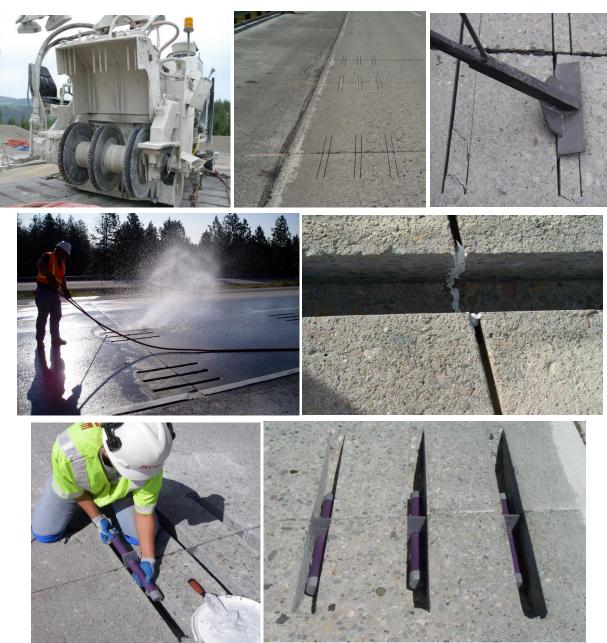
Typical Dowel Bar Retrofit Sequencing of the Installation From Figure 4-9.7, Construction Procedures for Retrofitted Dowel Bar Installation Techniques for Pavement Rehabilitation 1998 (6)
